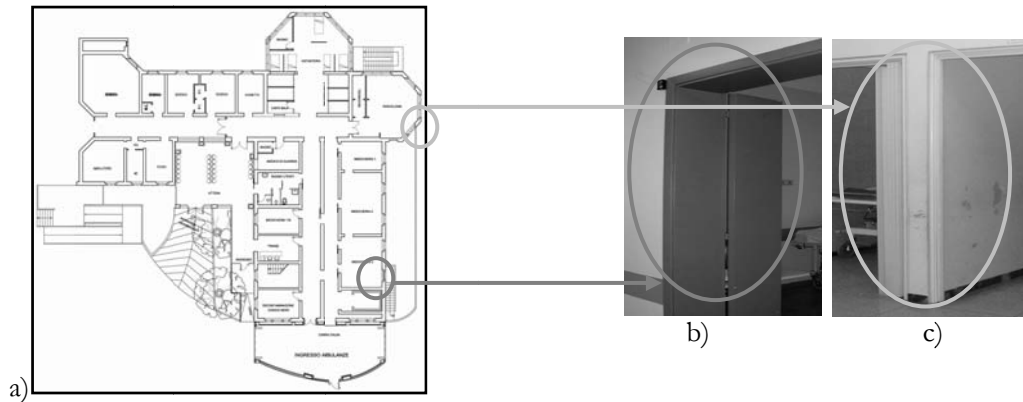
Ground level plan of the Senigallia Hospital Emergency division (a); details of a 0.4 m thick solid brick wall (b) and of a partitioning wall (c).
